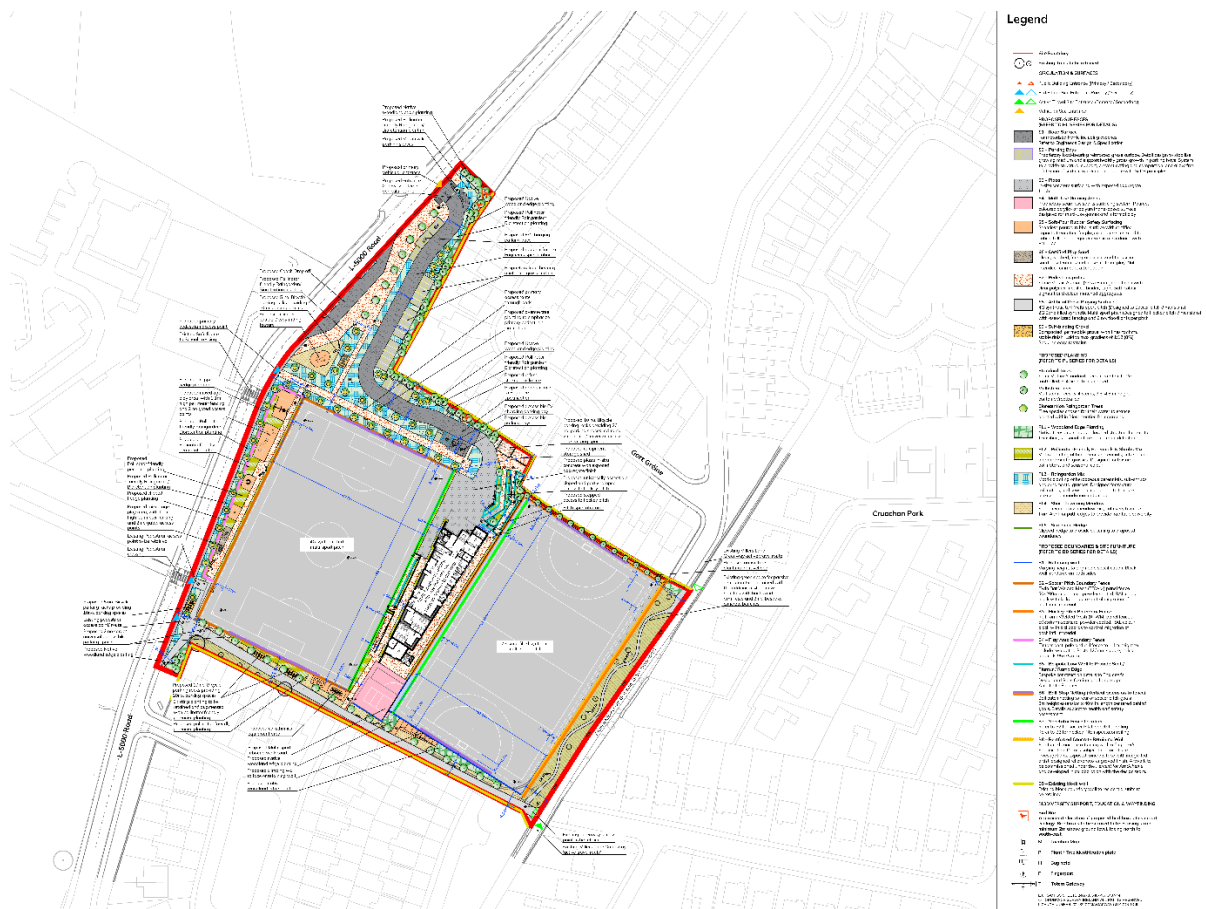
Proposed Site Layout Plan of Millers Lane (Drawing P612-MIL-LD-GA-101)
